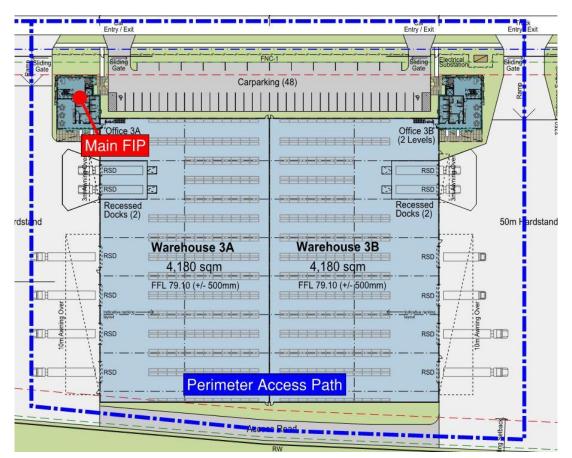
Fire Brigade Access and Site Facilities – Warehouse 3
